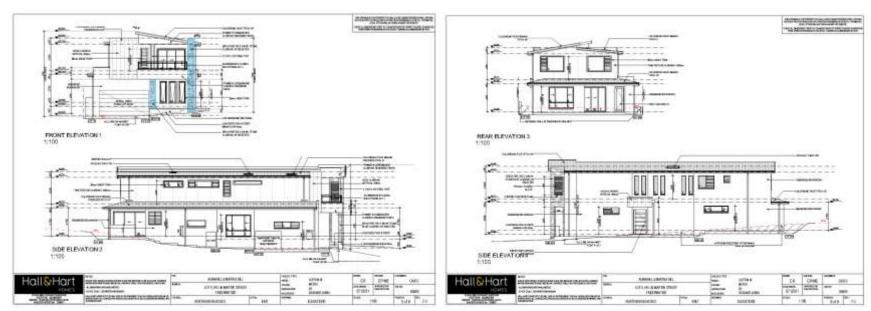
Previous pages illustrates the as proposed floor plans, above illustrates Elevations & 3D graphics.
